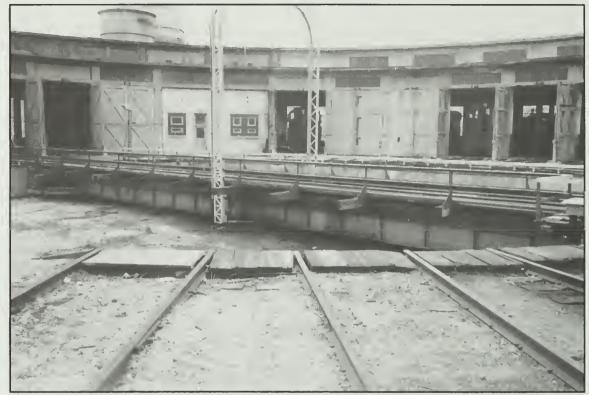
EJ&ERR: East Joliet Shops, Roundhouse (1911, 1924), Joliet.
